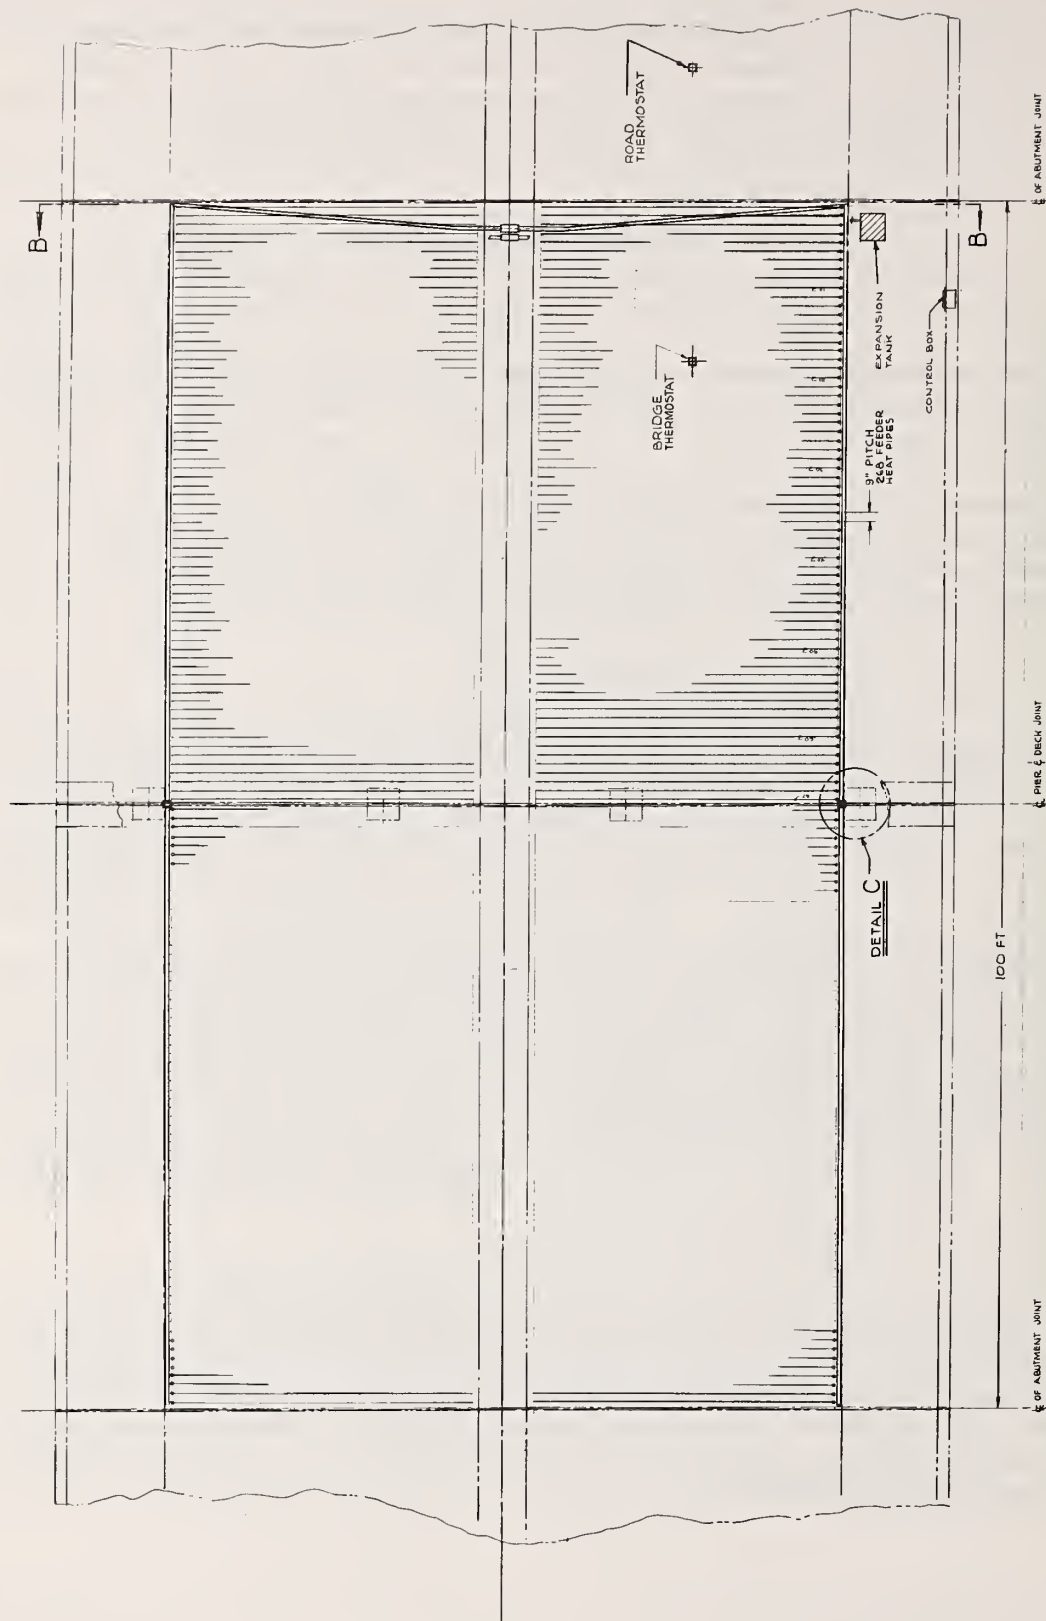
Bridge heat pipe installation (new bridge), sheet 1 of 3
